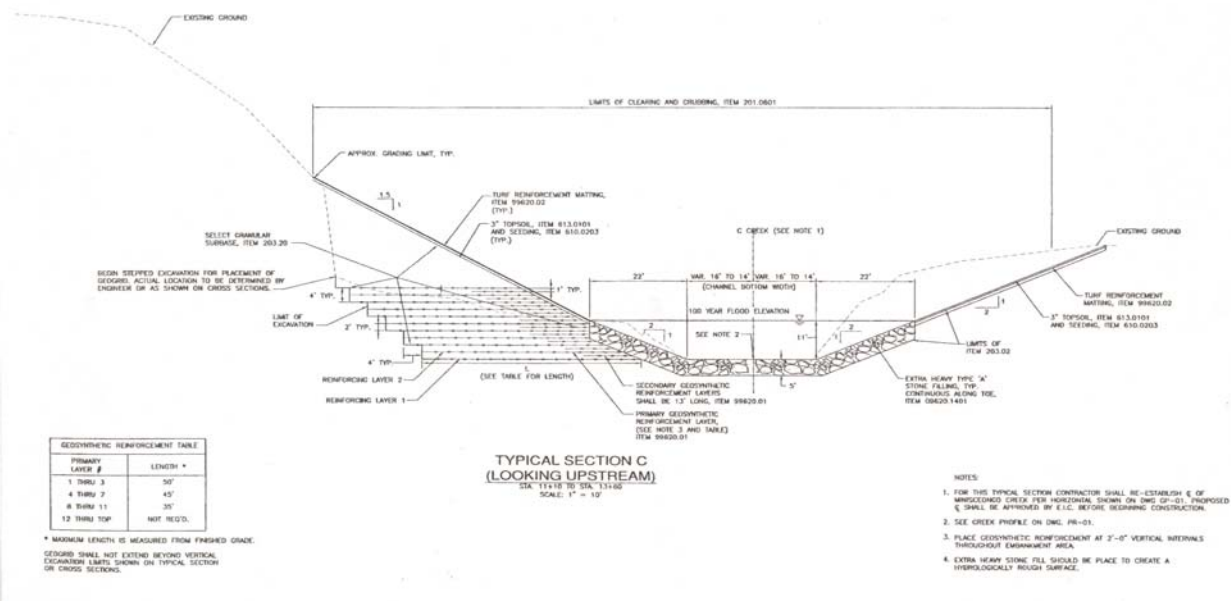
Geosynthetic Reinforced Soil Embankment Typical Section.
